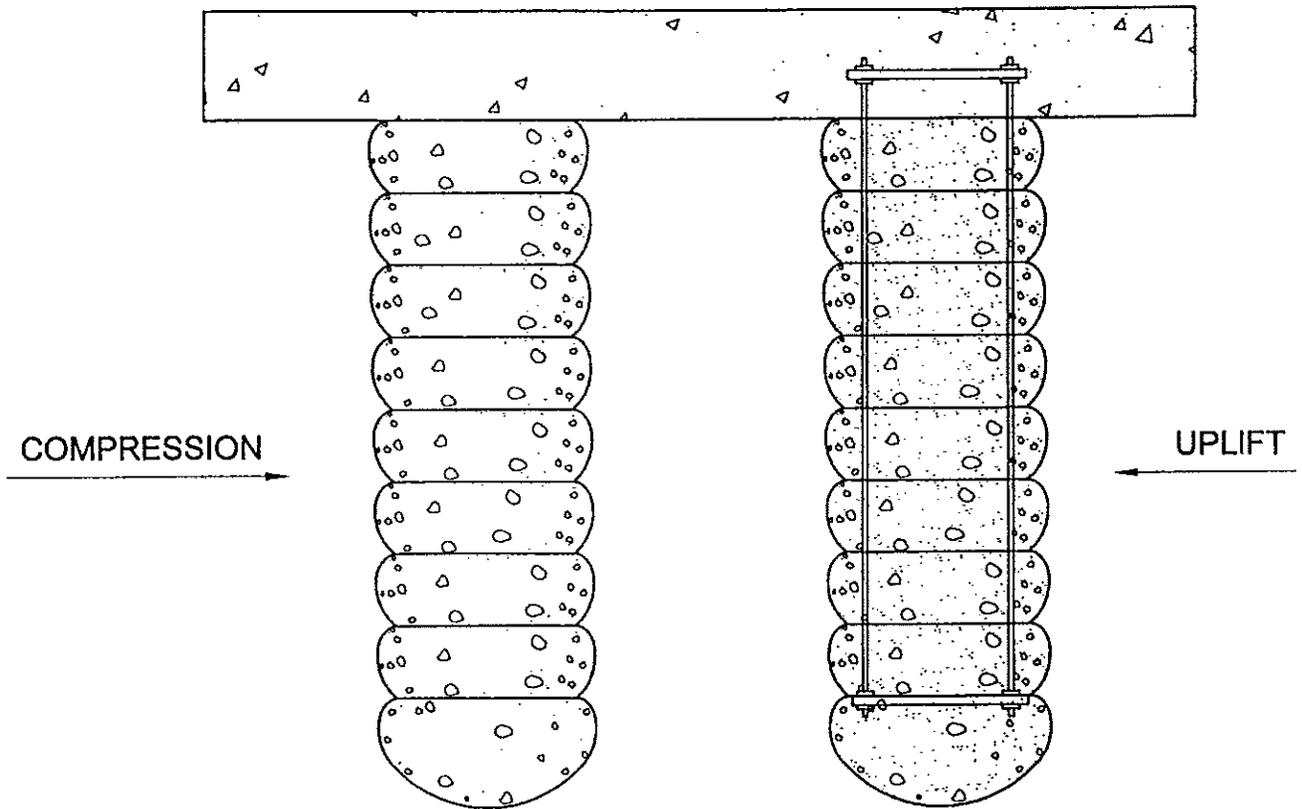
Typical Geopier Foundation Cross Sections
